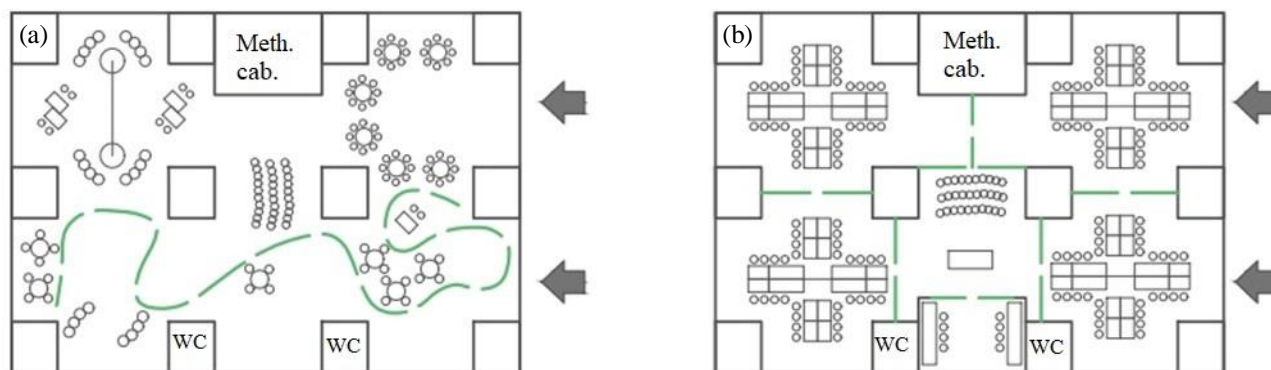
Examples of section arrangement, open planning (a), sectional planning (b) (author`s material)
